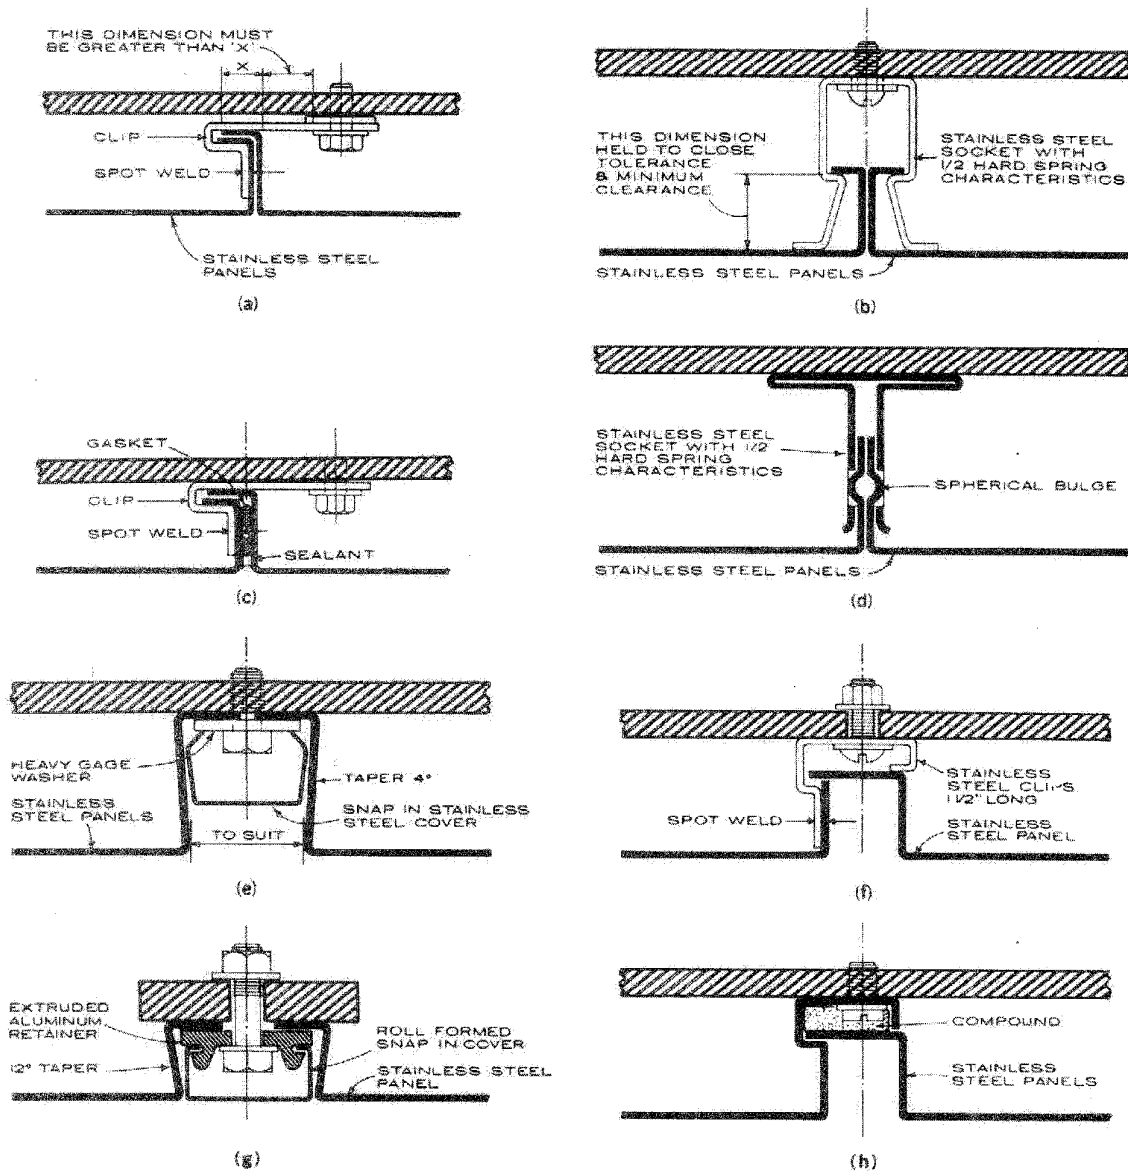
Typical architectural joints. (a) Standard joint; (b) typical snap-in panel joint; (c) interlocking flanged joints; (d) typical removable snap-in panel joint; (e) recessed panel joint; (f) interlocking recessed panel joint; (g) recessed panel joint with flush snap-in cover; (h) interlocking recessed panel joint with sealant.
